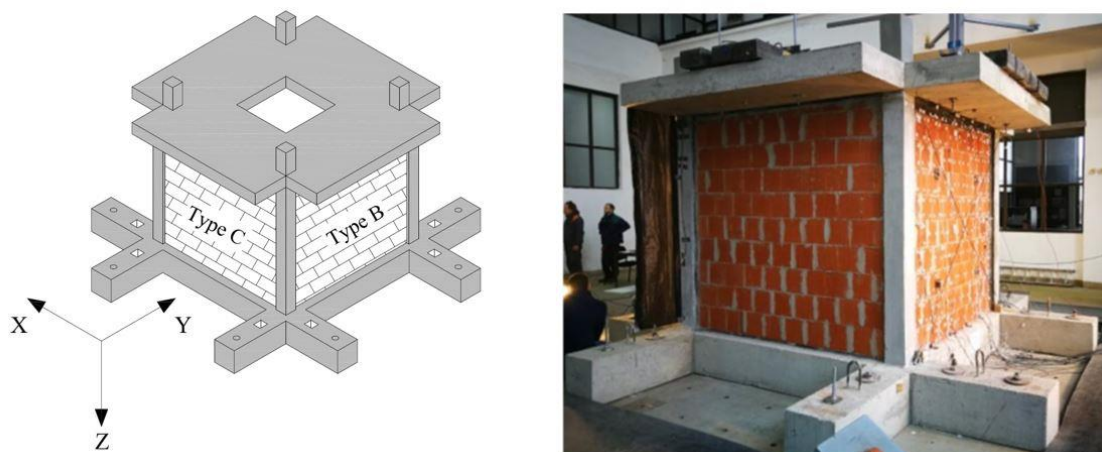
Views of the 3D building; schematic drawing (left) and real (right).
